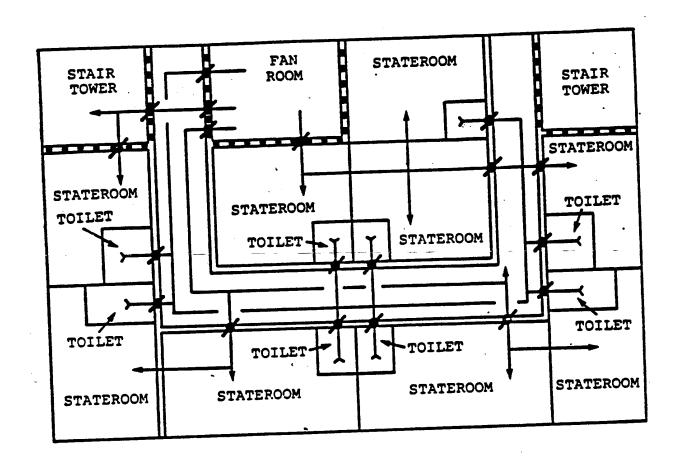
Draft Stop in Stair Tower Lining Between Decks.
